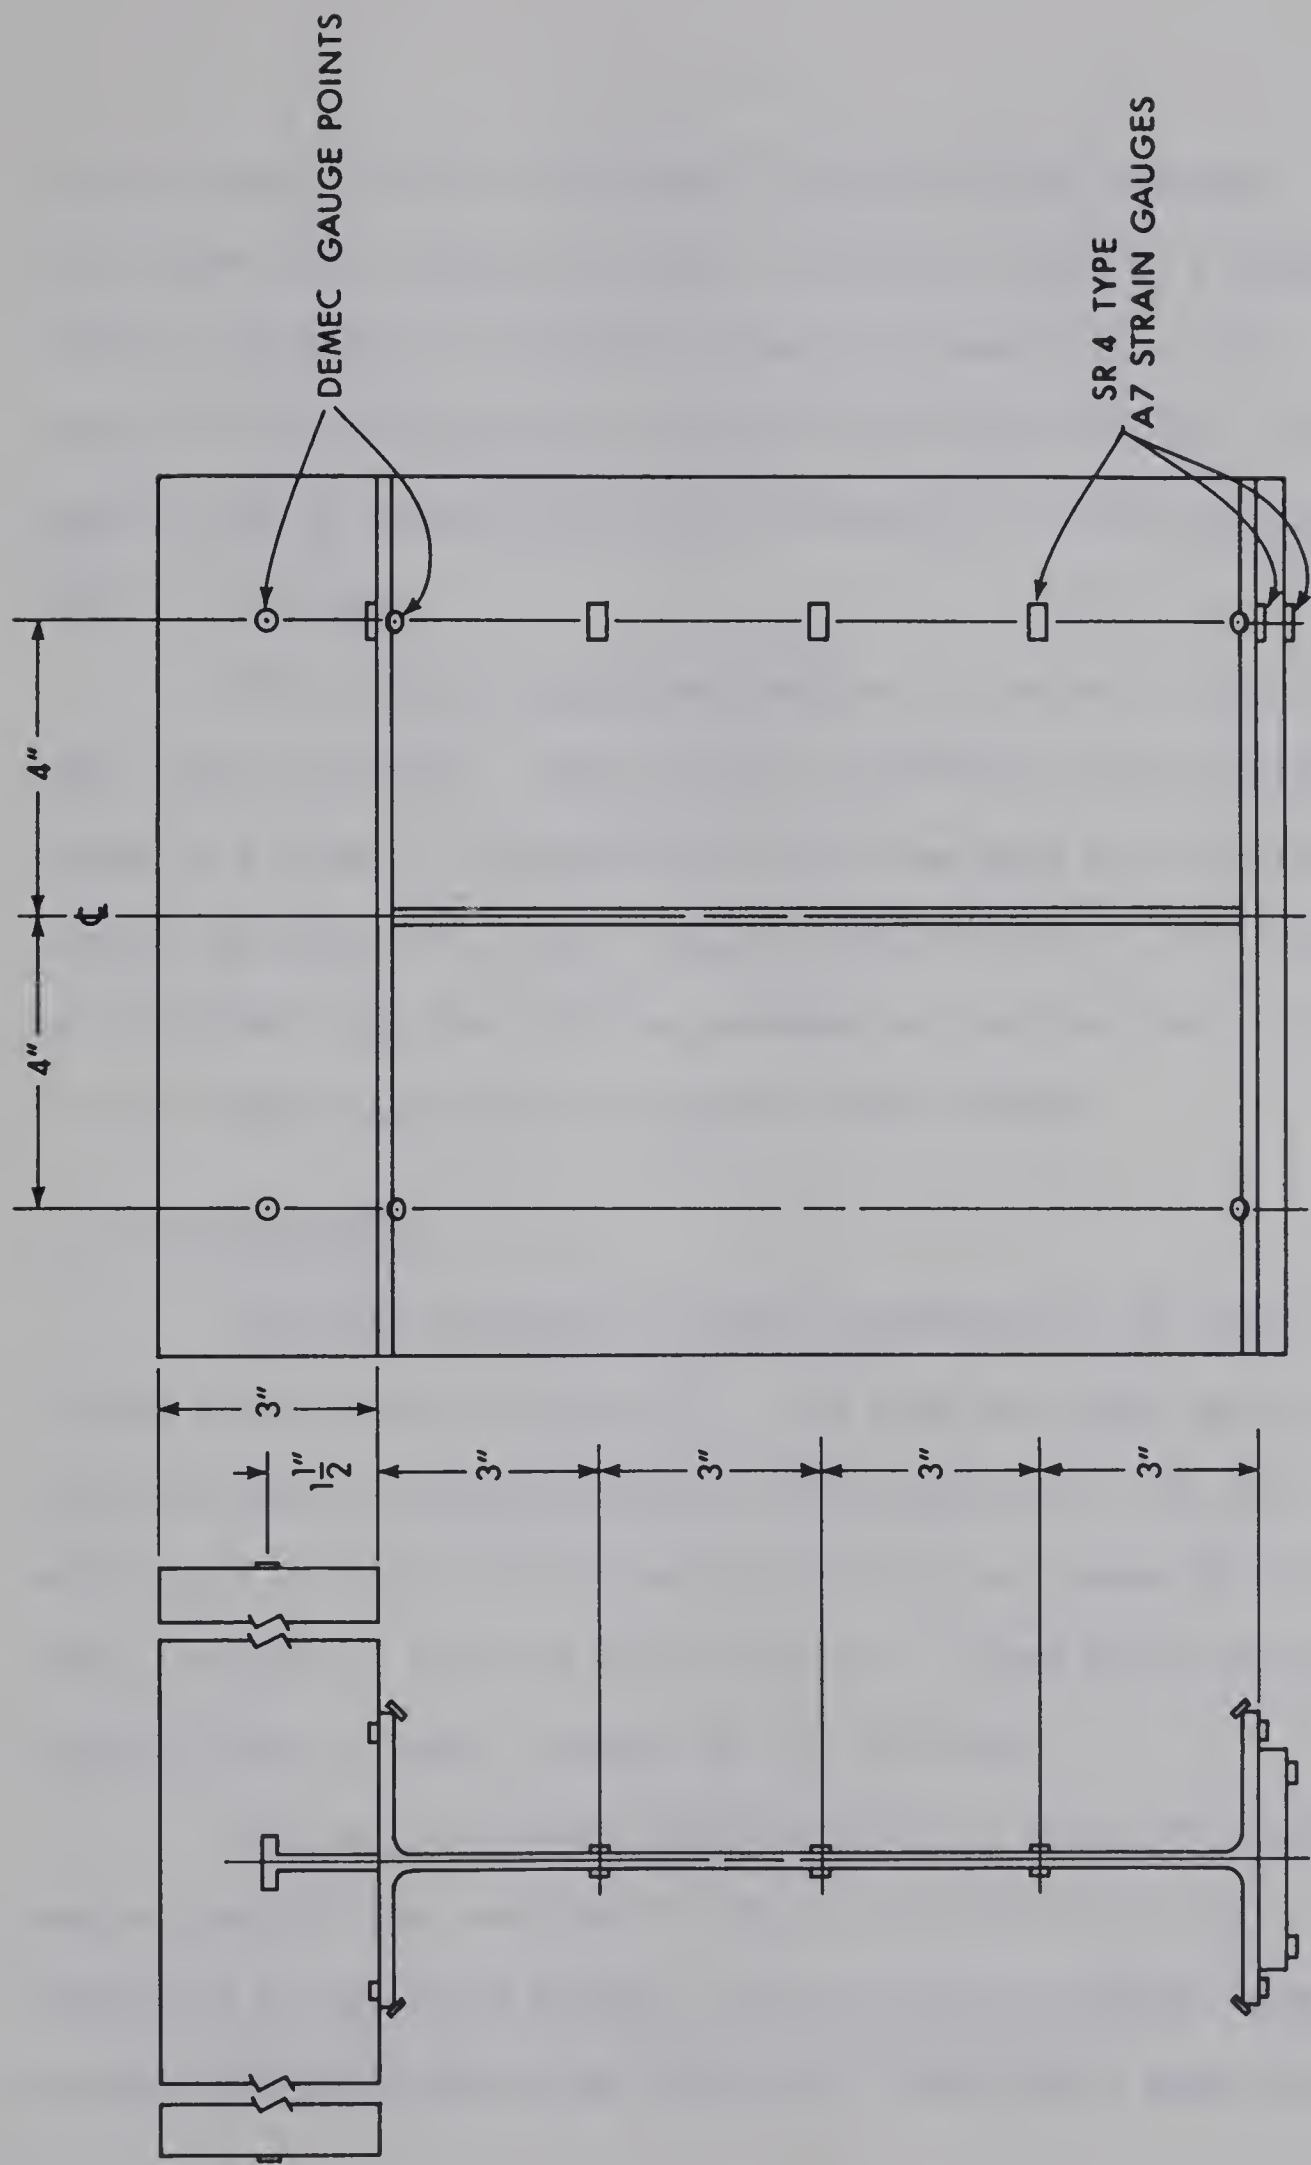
INSTRUMENTATION OF STEEL BEAM SECTION
